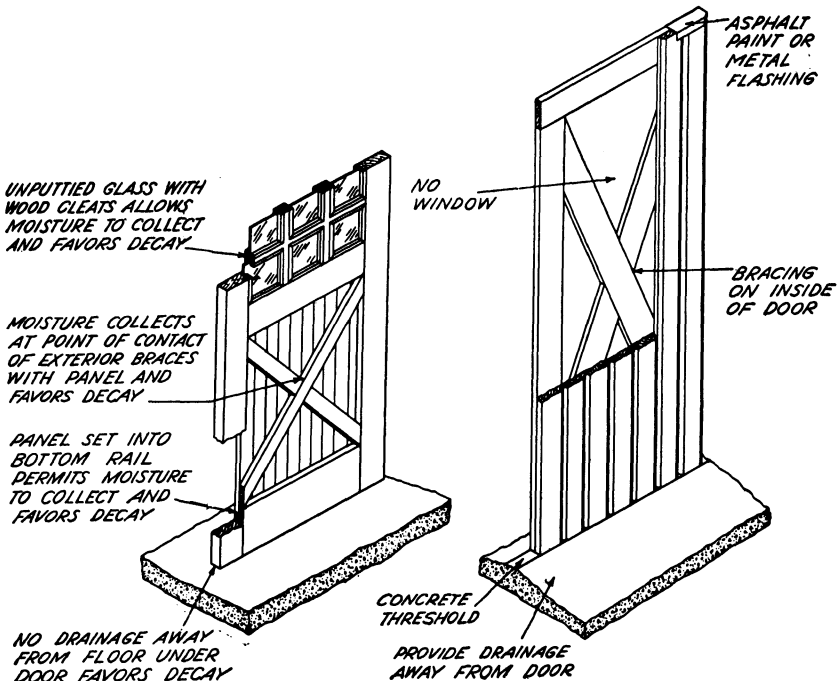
Poor and good practice with garage doors. If window is installed, prime and back-putty before glazing and set cleats in putty mixed with white lead.
